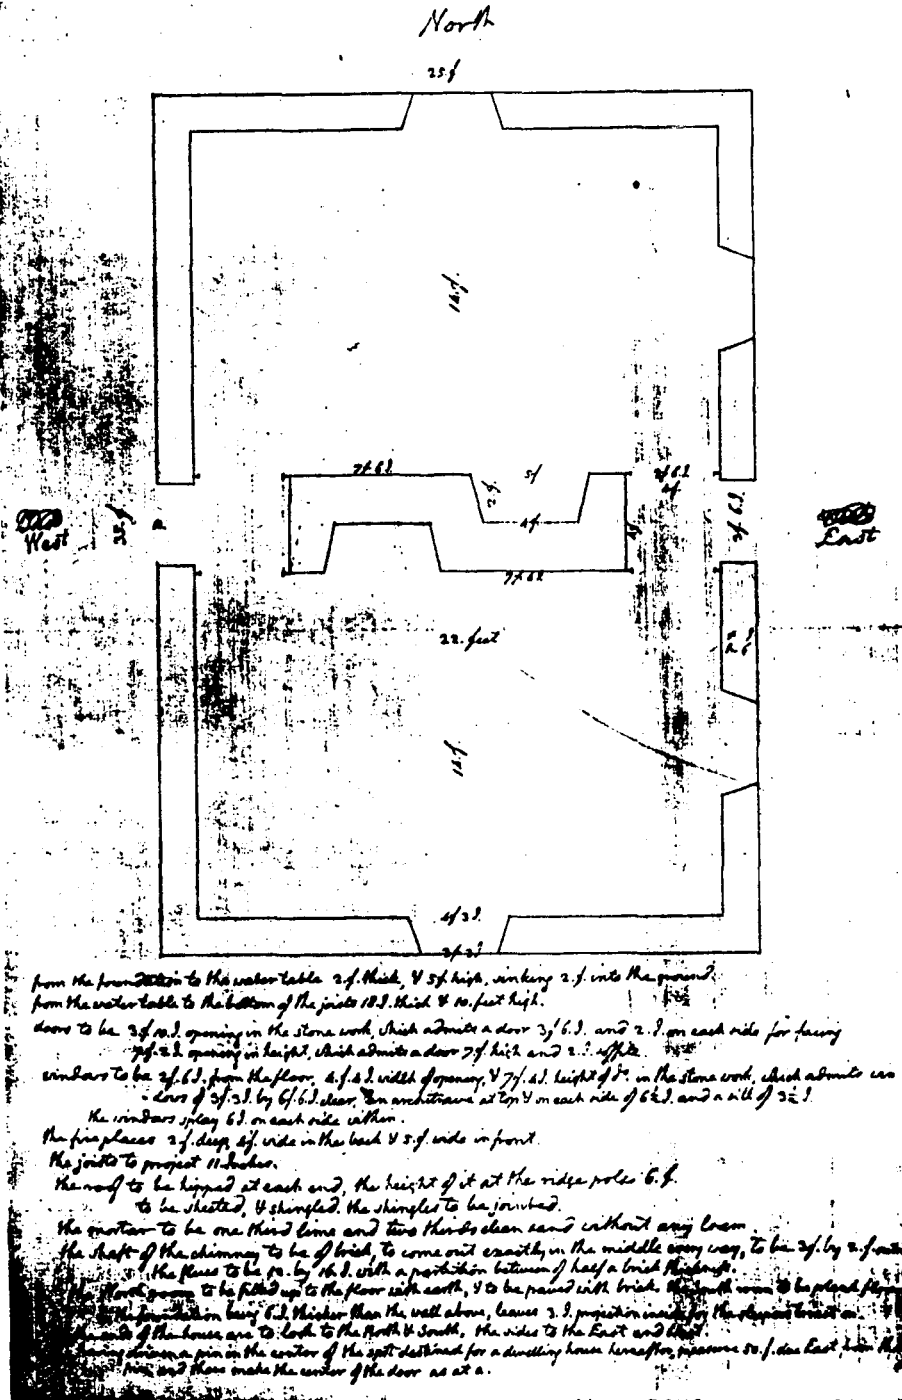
Plan and directions for construction of kitchen/washhouse at Poplar Forest. (Source: Kimball, Thomas Jefferson, Architect).
